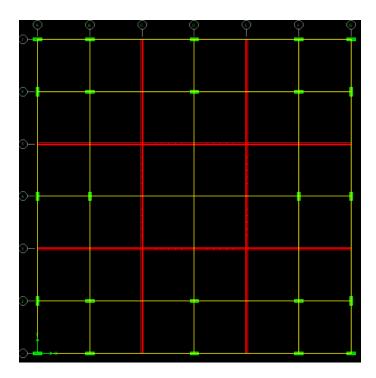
Top plan of building model 9 showing the outrigger at top
